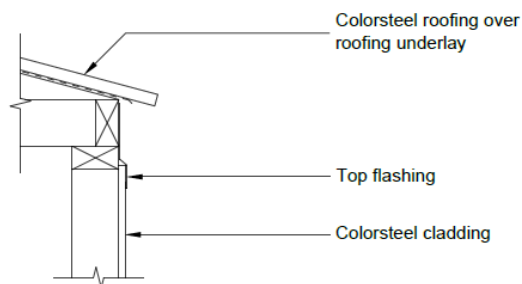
Roof gutter edge detail (used with permission from Versatile Homes and Buildings)
